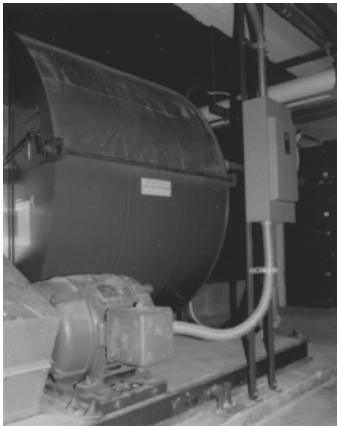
Correctly installed flexible conduit between electrical disconnect and motor. The flexible installation reduces fan and motor vibration in the floor slab.
